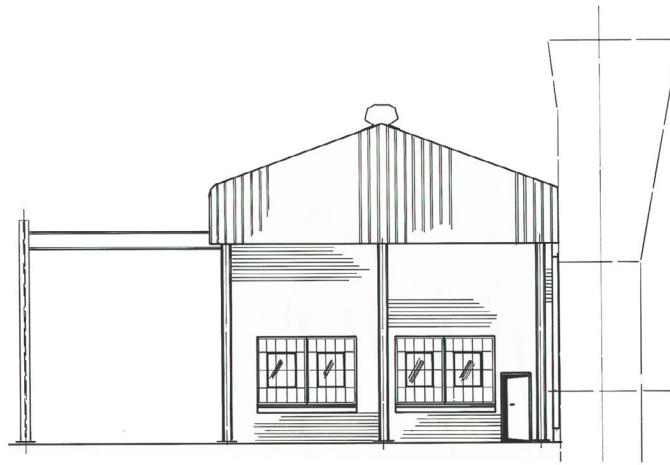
An elevation and section of the ventilation shaft's supporting structure which houses the motors for the centrifugal fans (Mine archive, 1988)
